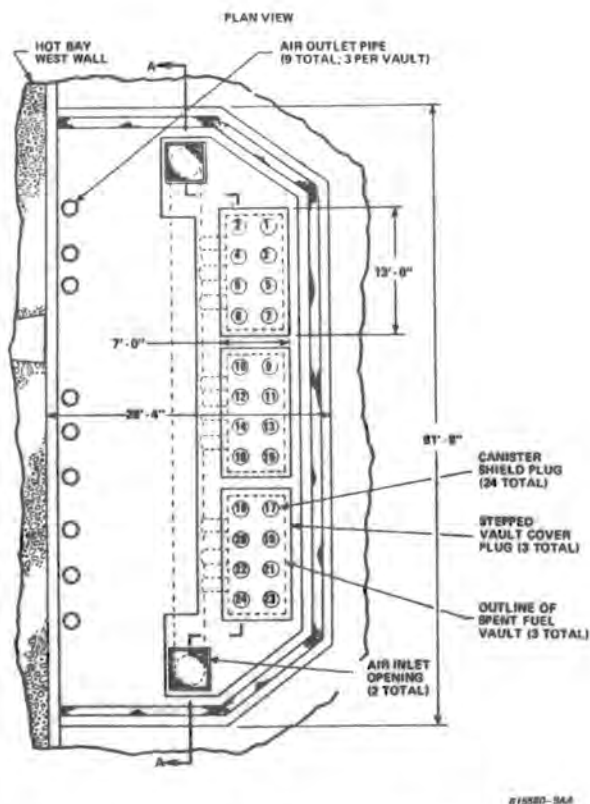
Lag Storage Pit Plan View at Floor Level
